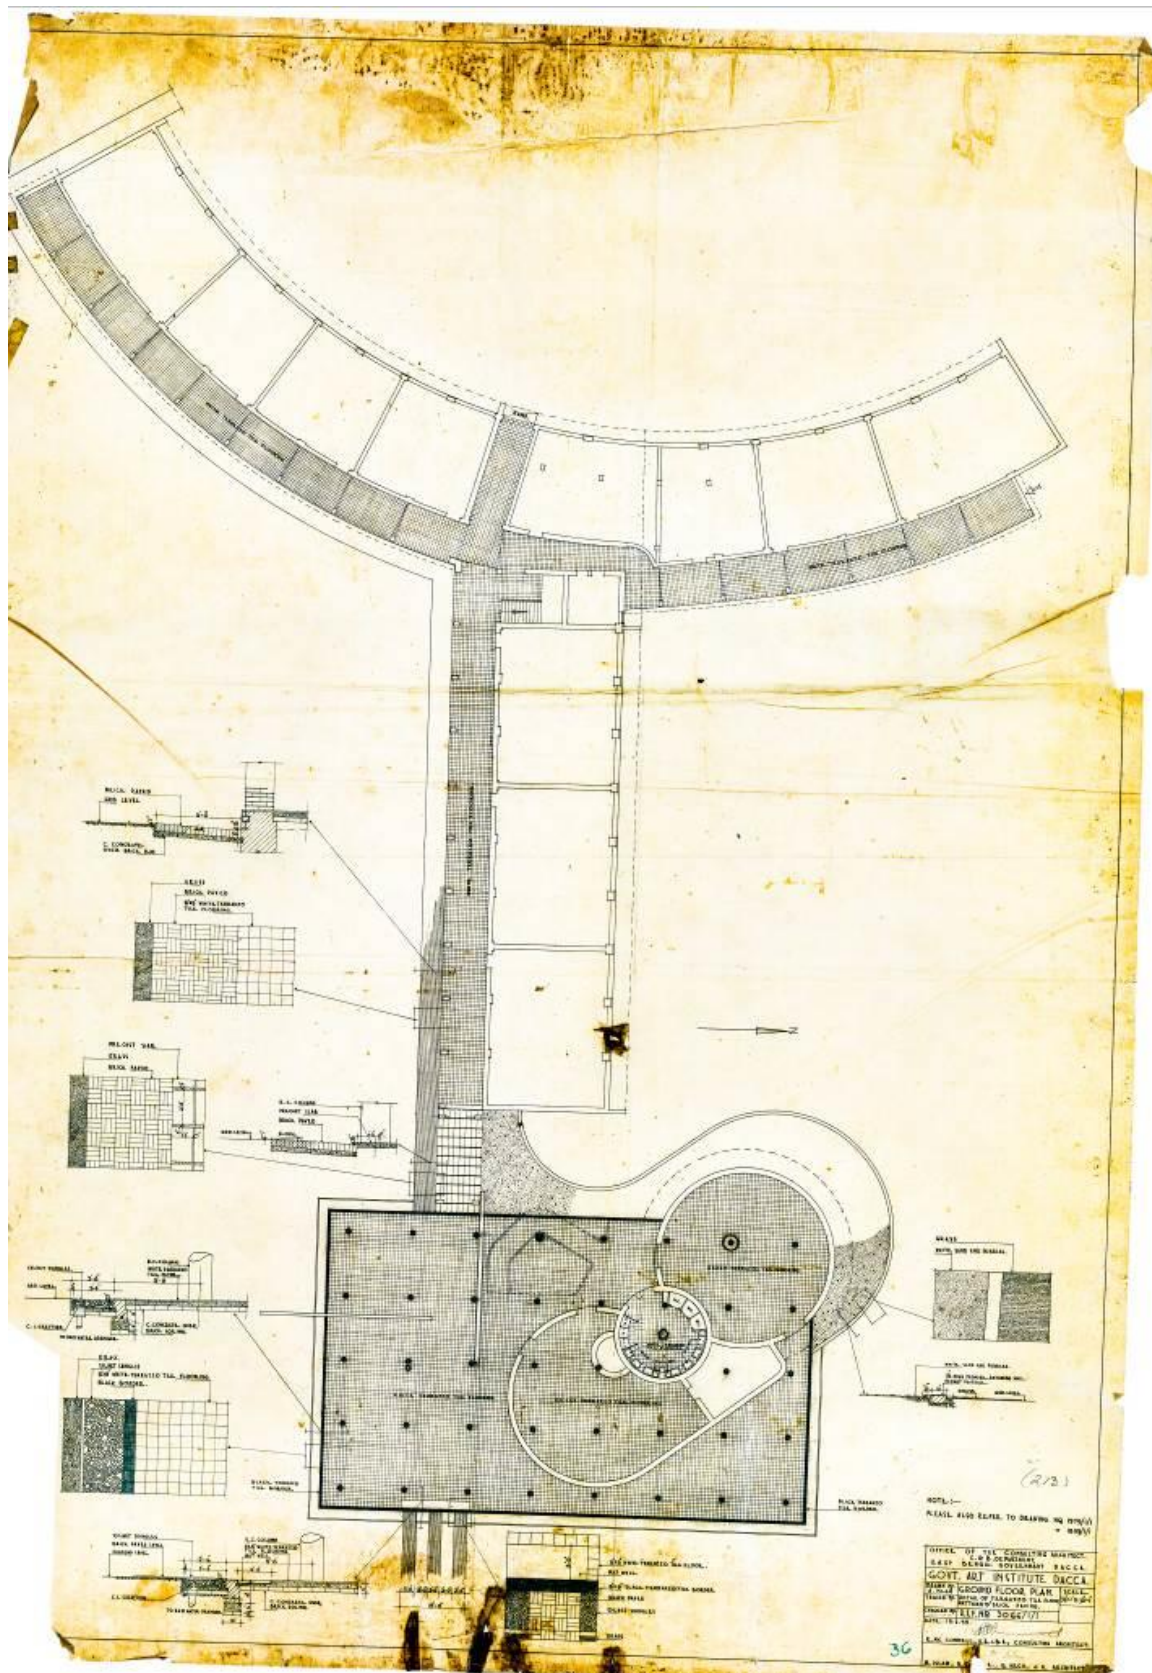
Floor Finish drawing, Institute of Fine Arts.
